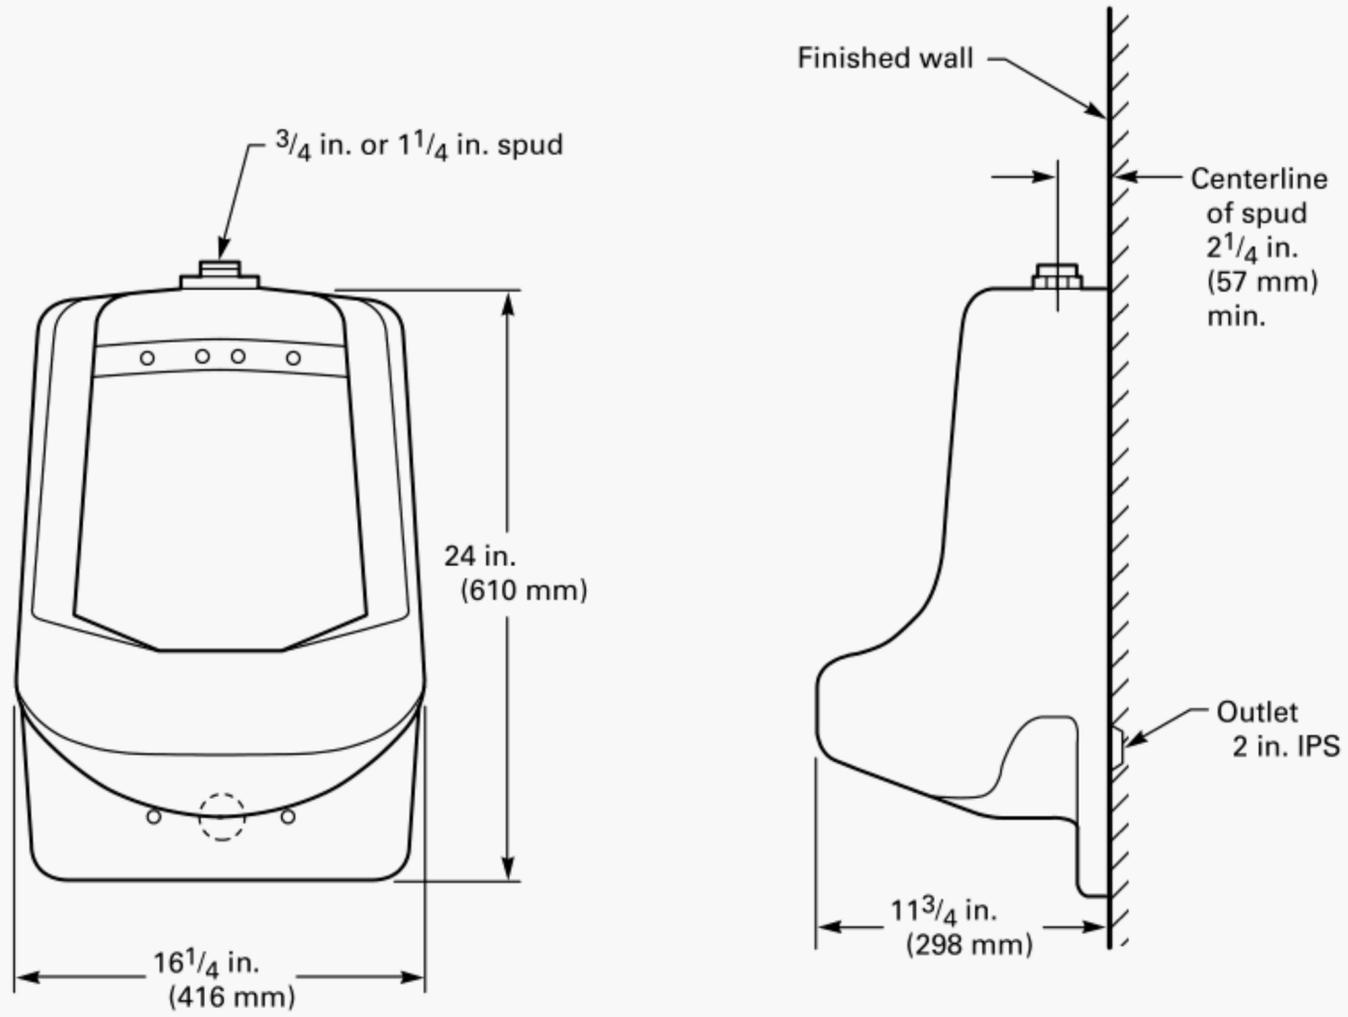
Wall-Mounted Siphon-Jet Urinal With Extended Shields
